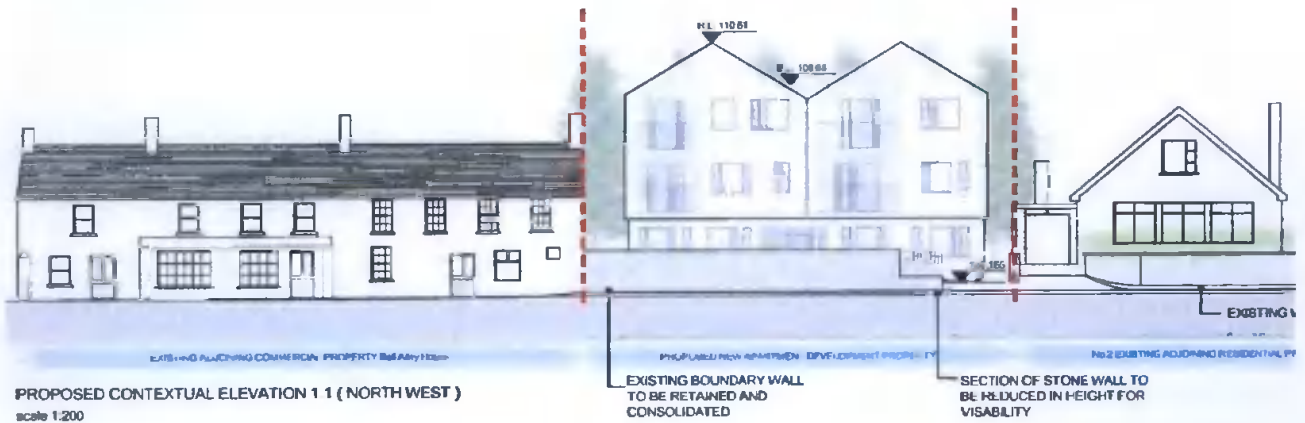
Front elevation of development refused for being out of character and impact on amenities
